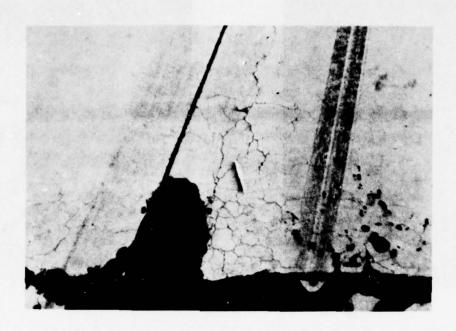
Surface Cracking and Joint Distress, Stapleton Airport.
